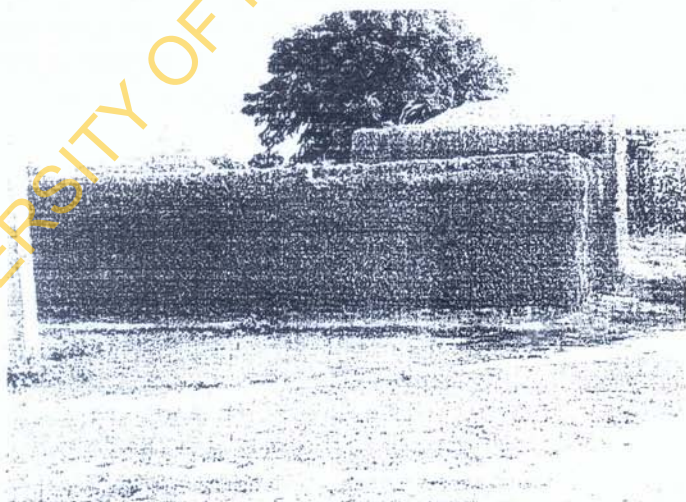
Mud house in Birni Morgaji, Zamfara State. Note the round mud roof, thatch roof and mud wall fence.
